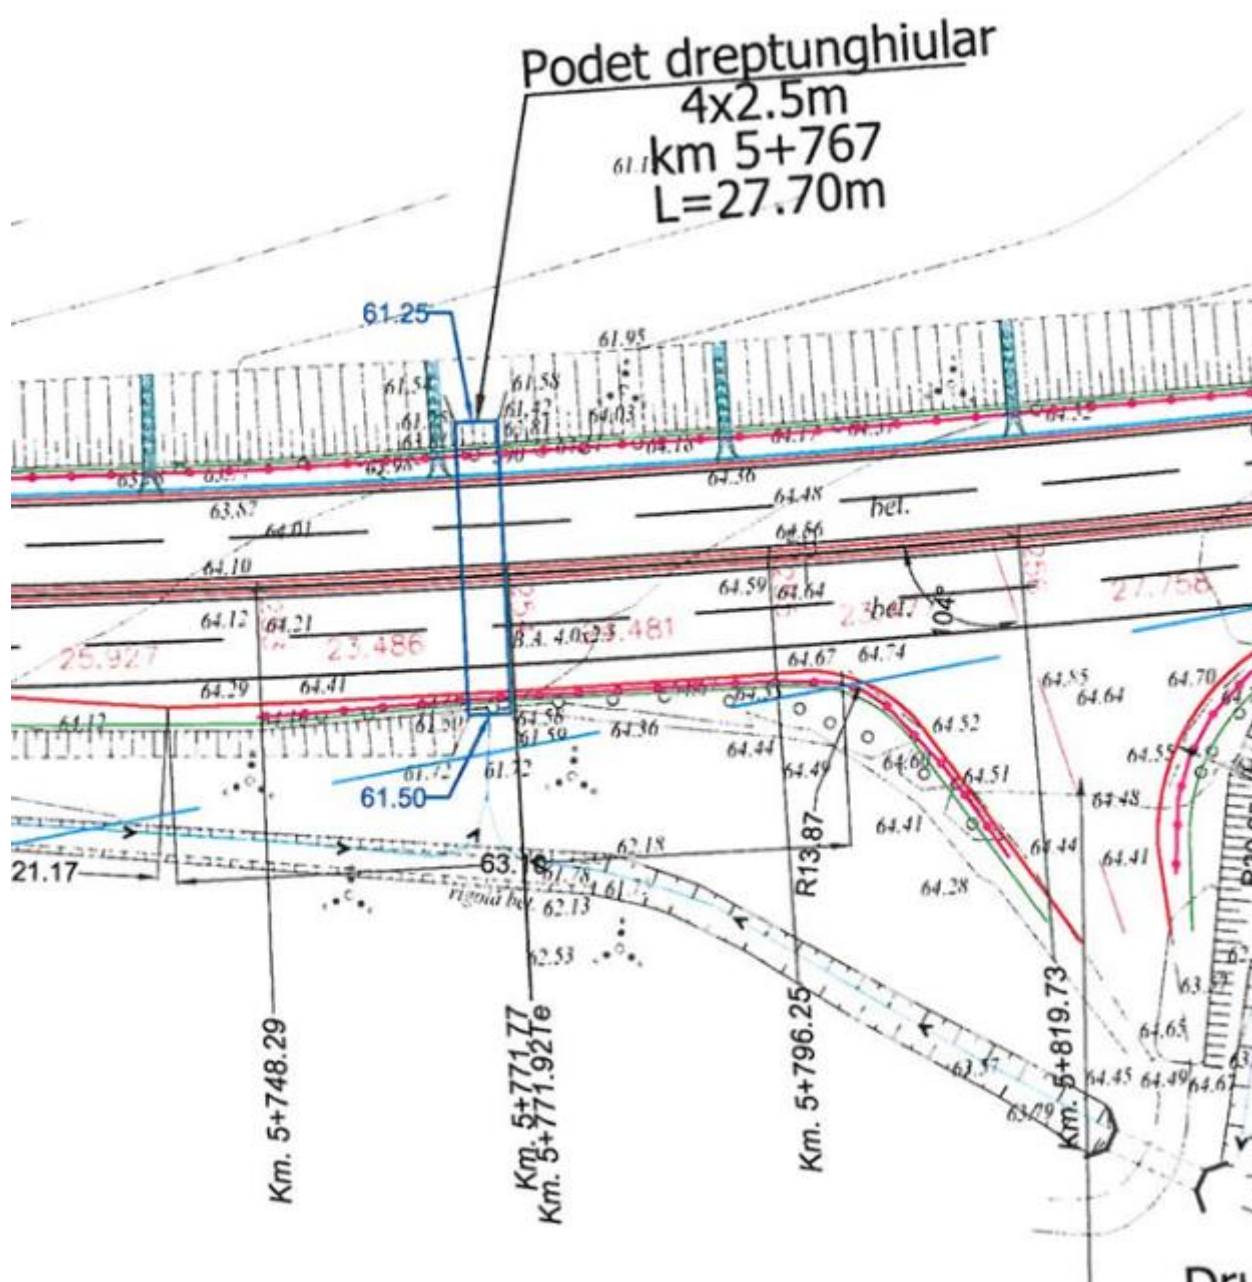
Plan of the bridge 5+767, which can be used by wild animals
